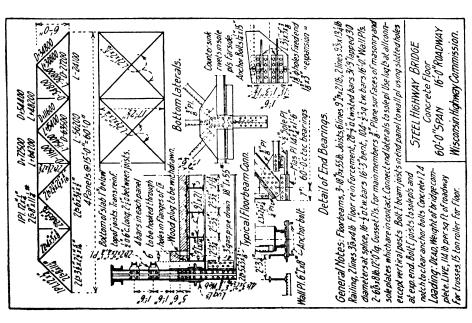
LOW TRUSS STEEL HIGHWAY BRIDGE.
